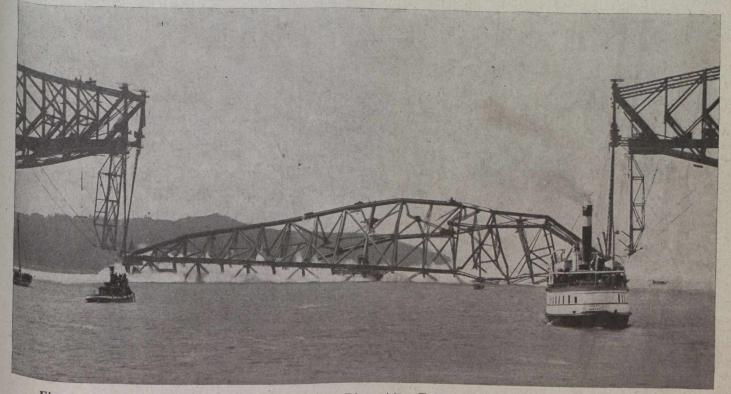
Taken Just as Centre Span is Falling into River After Failure of Casting on South Lifting Girder.
